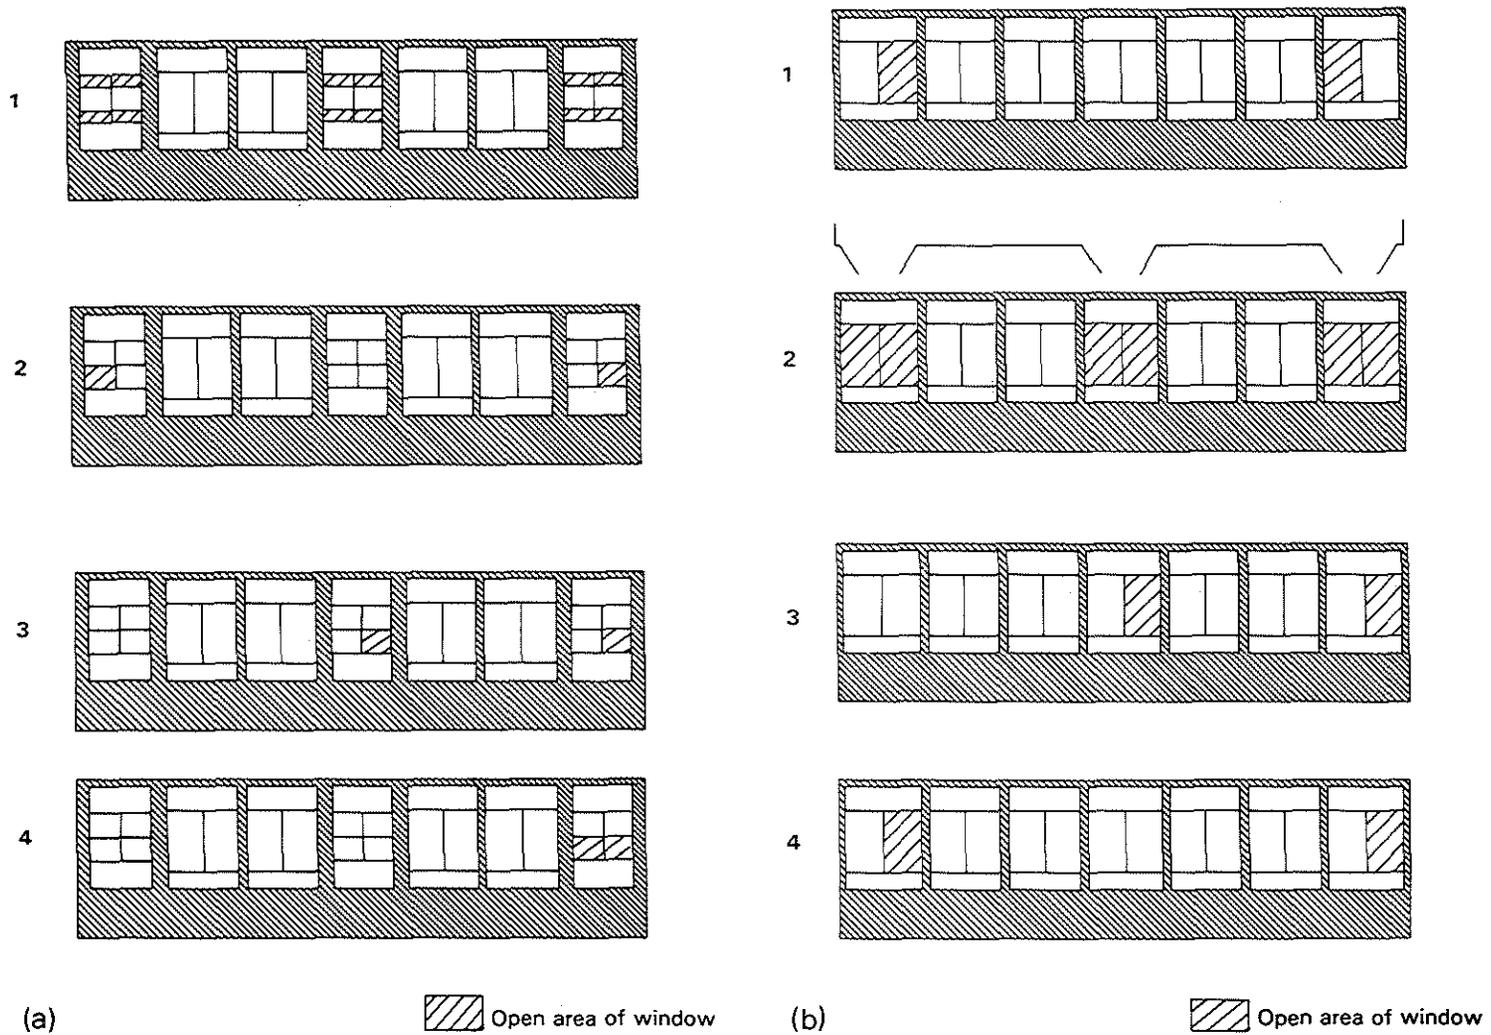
Building 2, arrangement of windows and combinations of openings used in the field measurements: (a) room A, vertical sliding windows; (b) room B, side-mounted casement windows
